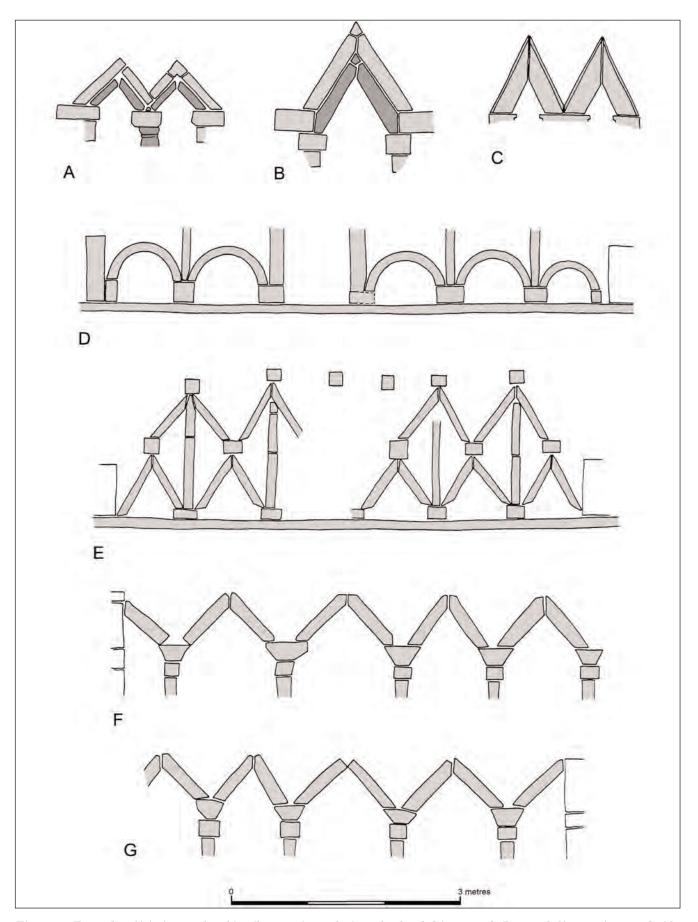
Examples of jointing employed in pilaster-strips and triangular-headed features. A, Barton: belfry opening, north side. B, Barton: north doorway. C, Deerhurst: tower windows, east side. D, Earls Barton: arcading, south side. E, Earls Barton: gable-headed features, south side. F, Barton: arcading, south side. G, Barton: arcading, north side. Scale 1:50. After Rodwell 1986
